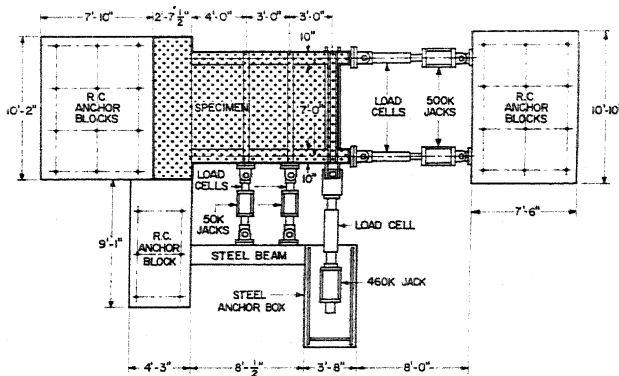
PLAN AND GENERAL VIEW OF TESTING FACILITY
